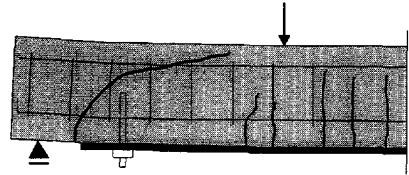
Shear failure by a plate-end shear crack in RC beam P2B plated in flexure and additionally bolted for anchorage (Sharif et al. [1994a]¹⁰)
